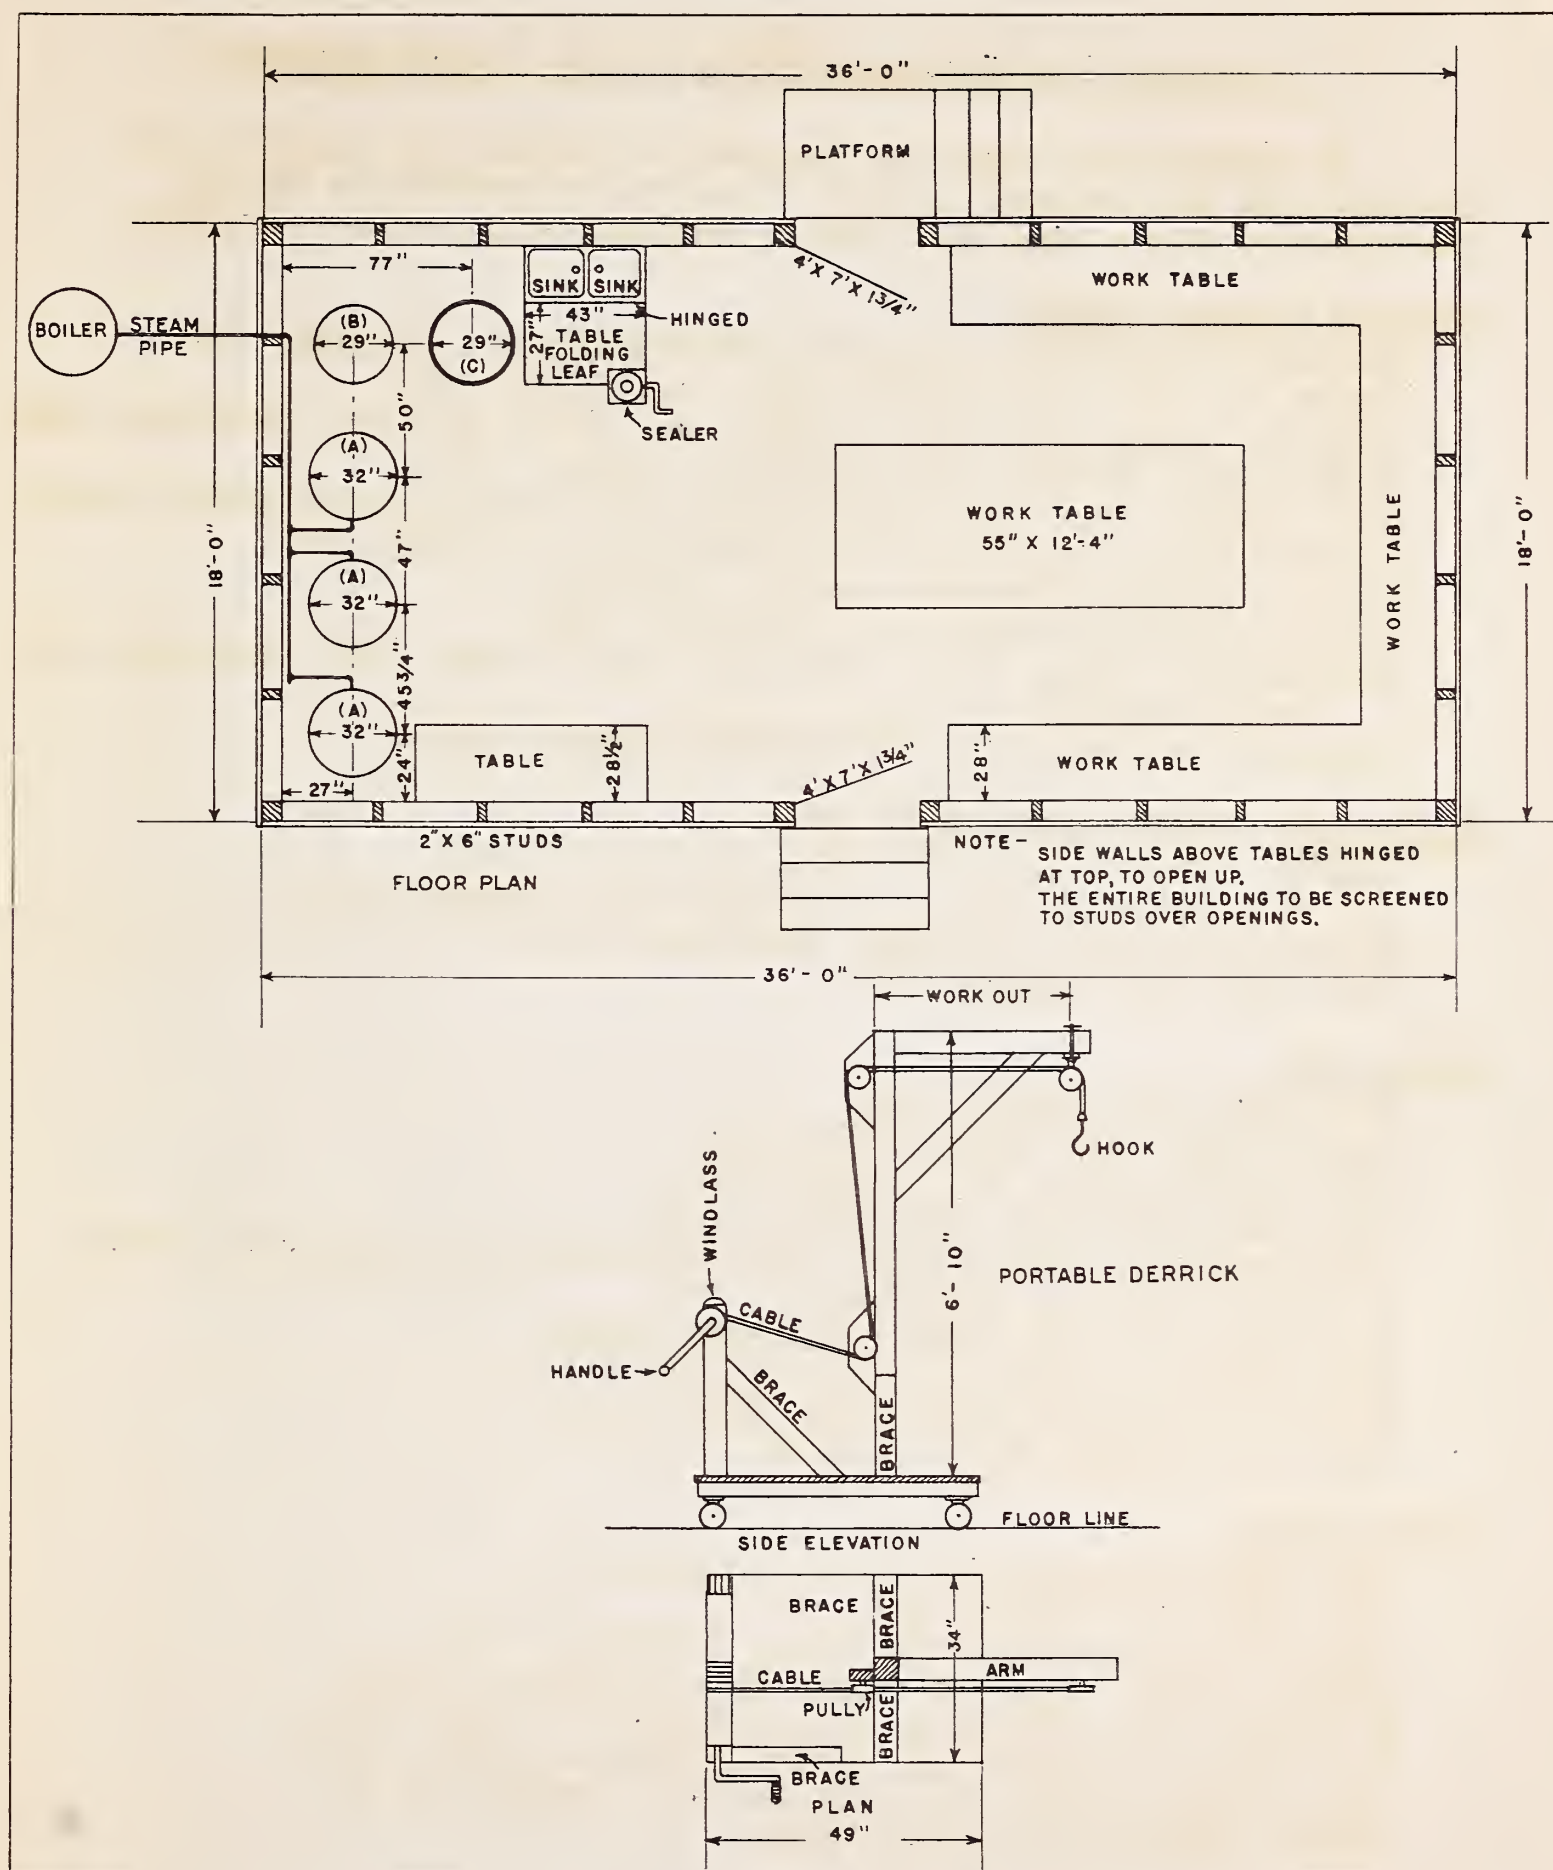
FLOOR PLAN OF COMMUNITY CANNING KITCHEN AT DURHAM, N. C.,
